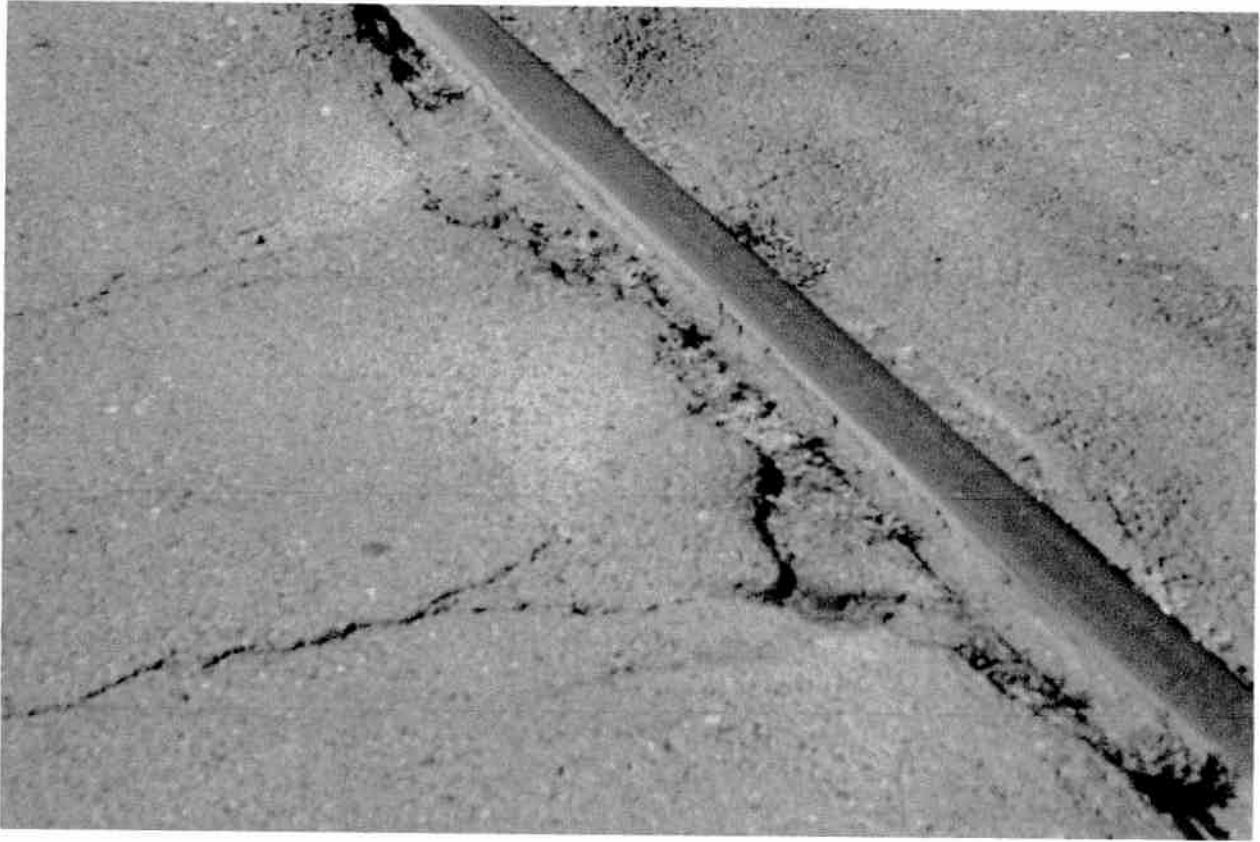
Potholes and road bed debris at N. Howard St. entrance to new parking lot.
